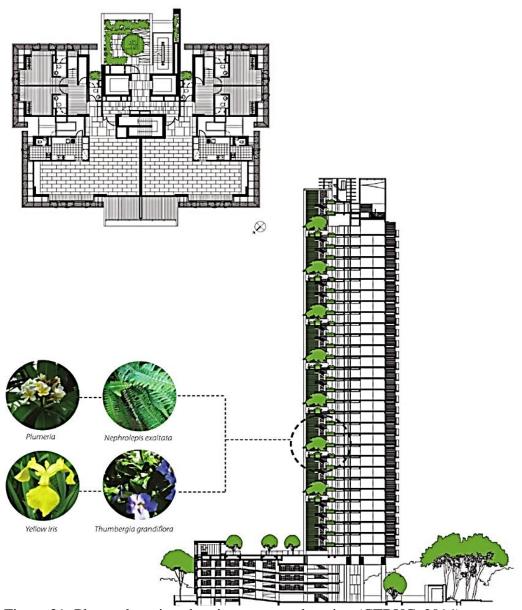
Plan and section showing greenery location (CTBUC, 2014)
